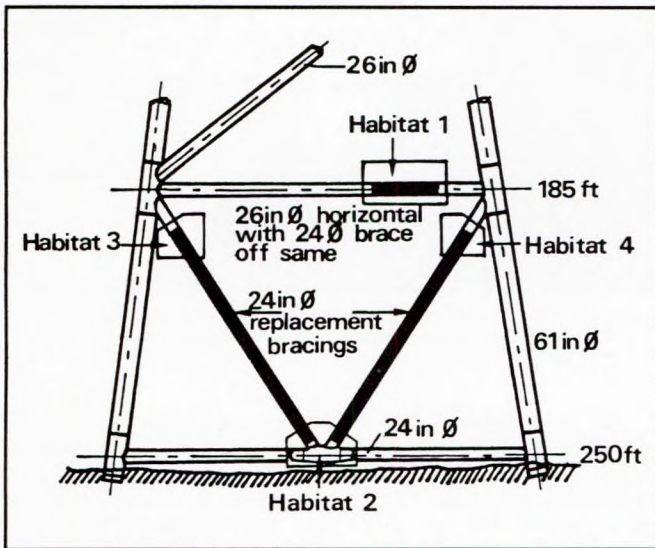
Elevation showing replacement members and welding habitats used in repair
